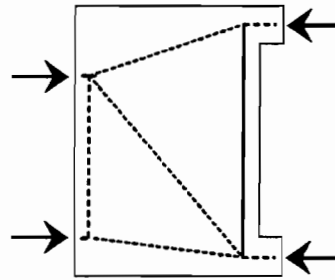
Strut-and-tie model for Washington Metro pier segments.
